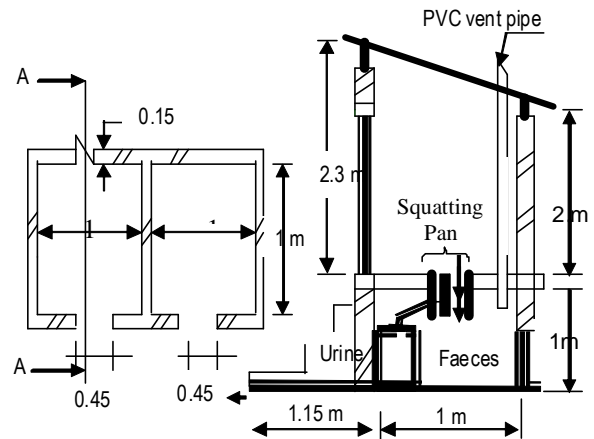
Floor Plan and cross section of double vault UDDT (Source: EEPKO, 2008).
